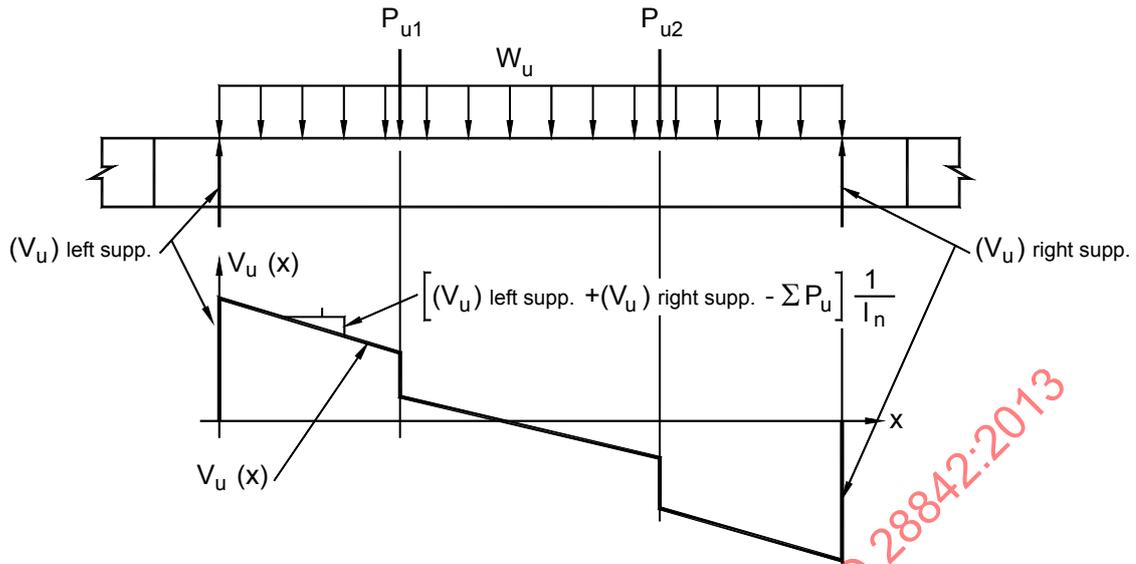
Calculation of the shear diagram of the beam or joist supported on beams or girders
